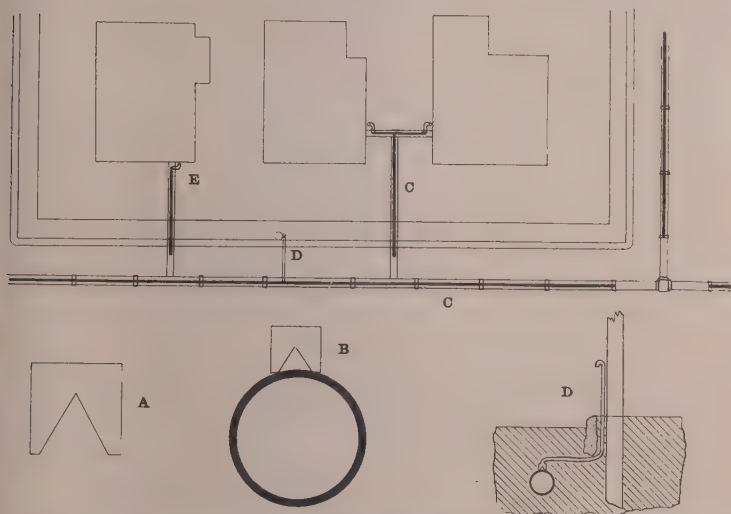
Protective arrangement against injury resulting from leakage of illuminating gas. A, cross section of protective conductor; B, adjustment of same to pipe; C, black lines showing method of arrangement of protective device on street and house service; D and E, vents for leakage.
